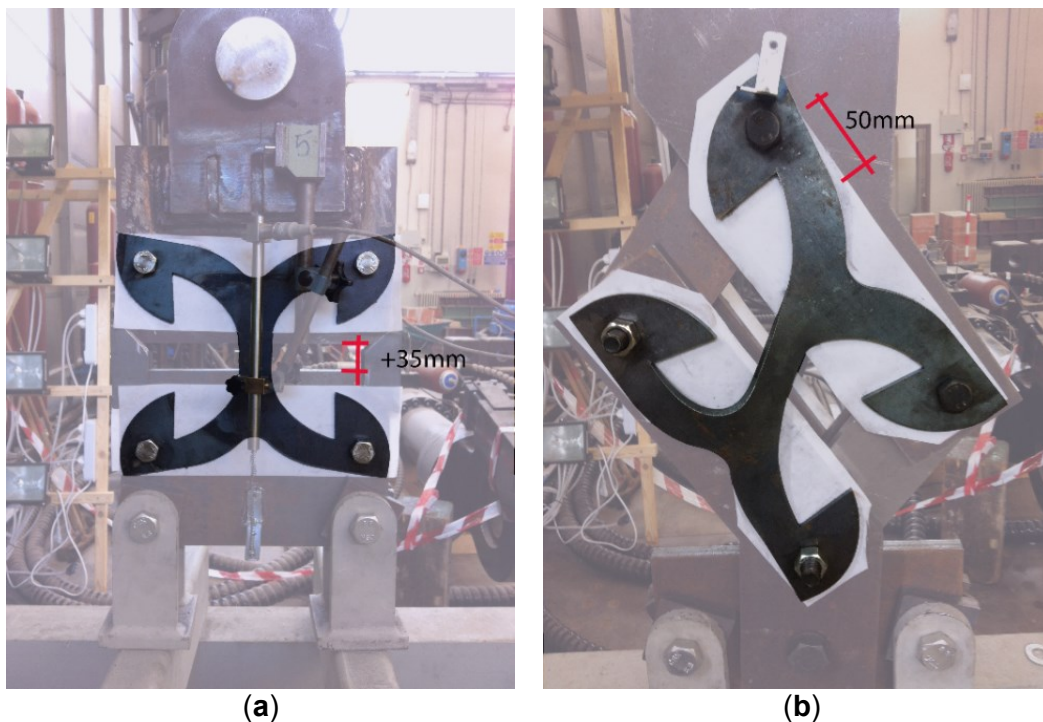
Deformed specimens: (a) Axial test; (b) shear test.
